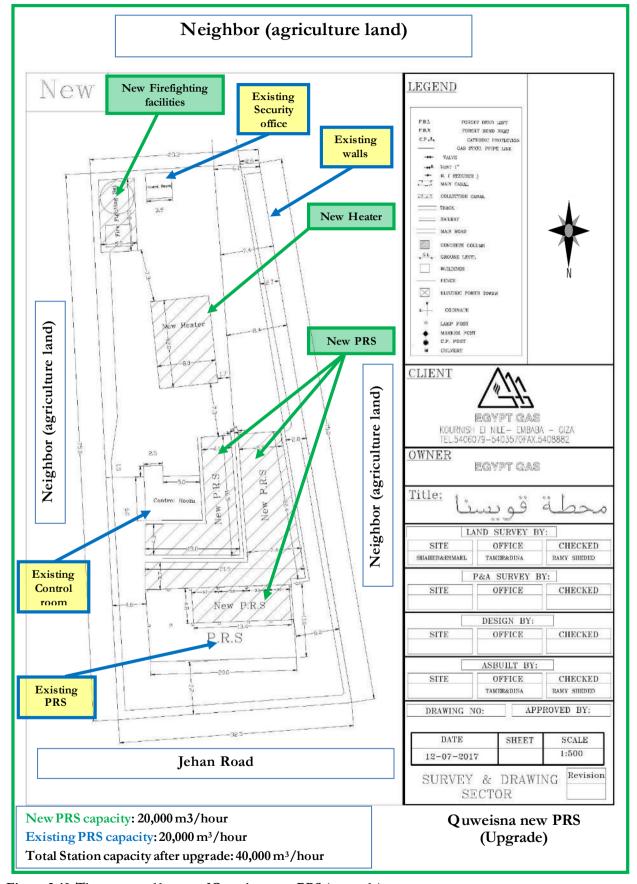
The proposed layout of Quweisna new PRS (upgrade).
